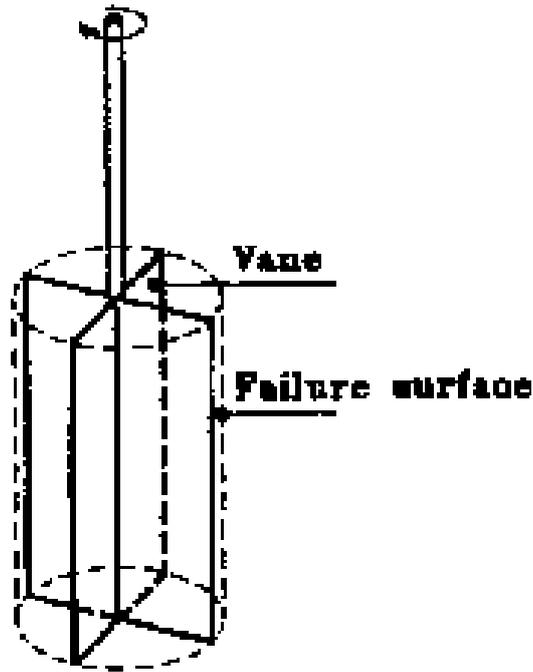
Field Vane Test (Information Technology in Construction, u.d.)
